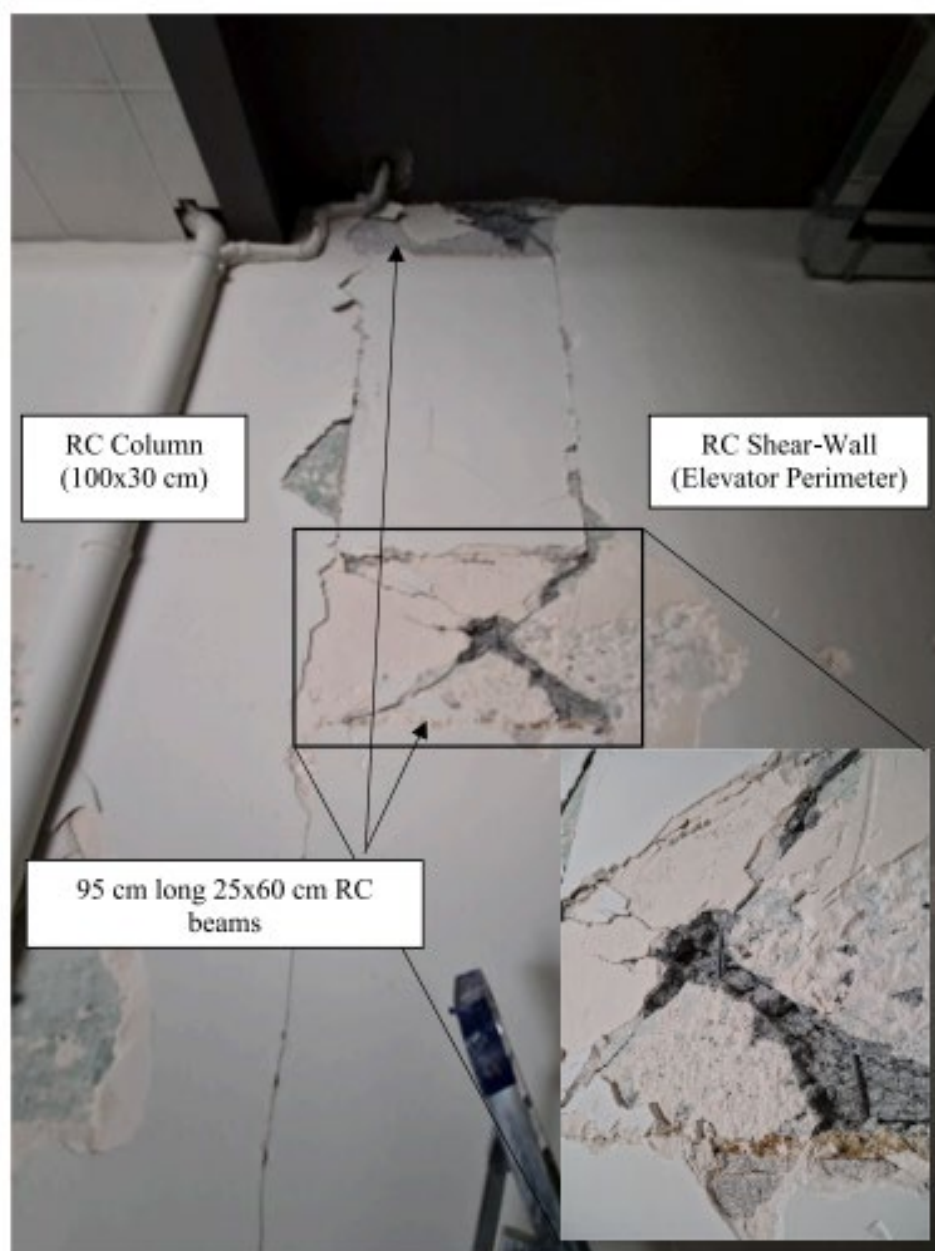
7: 95cm long beams damaged on the ground and mezzanine floor.
